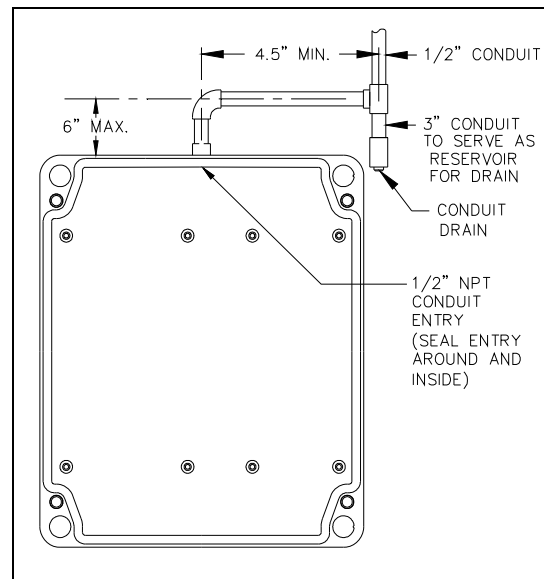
Top entry conduit installation details for metallic enclosures (NOT recommended)
